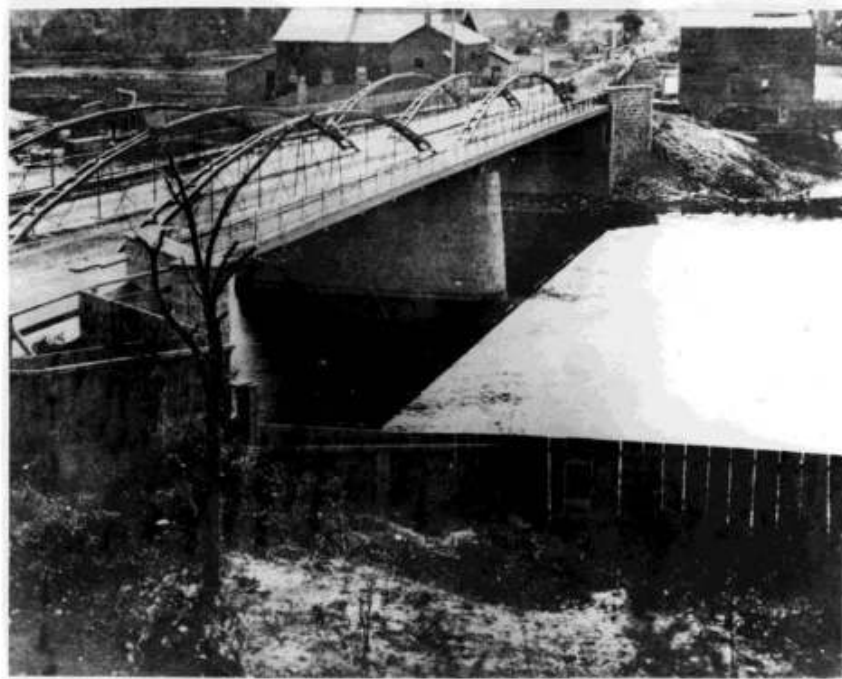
The “Old Iron Bridge” at the Lorne Bridge site (courtesy Brant Historical Society)
